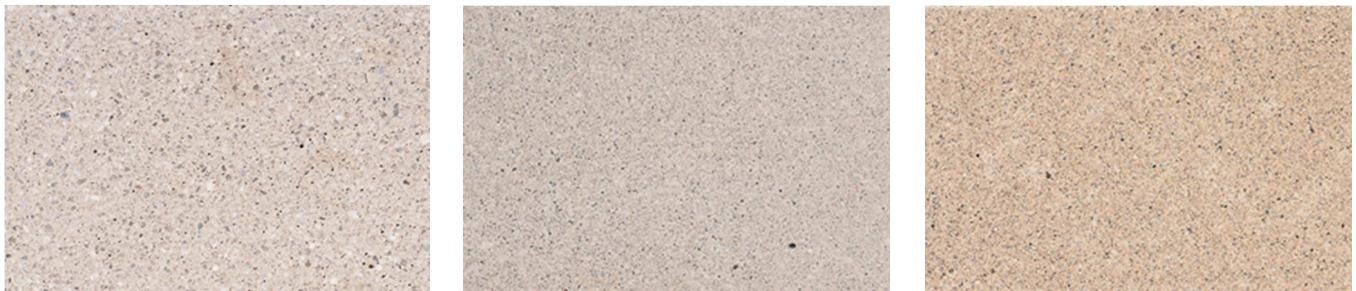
, 137, 138: PRECAST CONCRETE LIGHT RANGE, PRECAST CONCRETE MEDIUM RANGE, PRECAST CONCRETE DARK RANGE (LEFT TO RIGHT)
